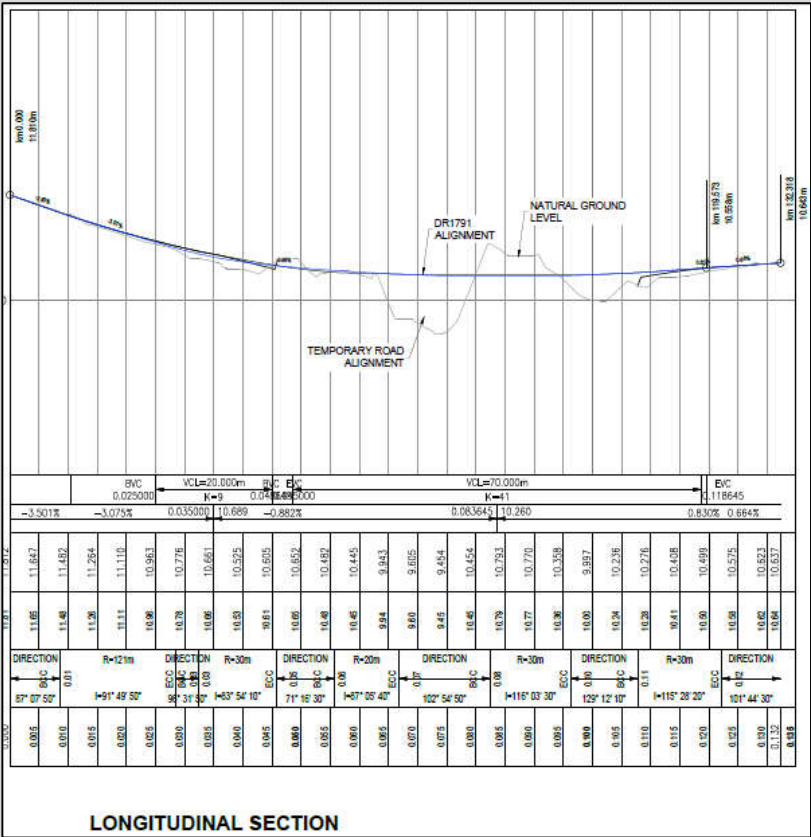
Downstream engineering design for the proposed causeway construction along DR1791, (Hatch Engineering, 2025).
